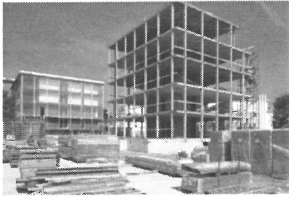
Balance housing development, Fällanden, carcass with visible concrete ceilings and wooden beams at façade level
